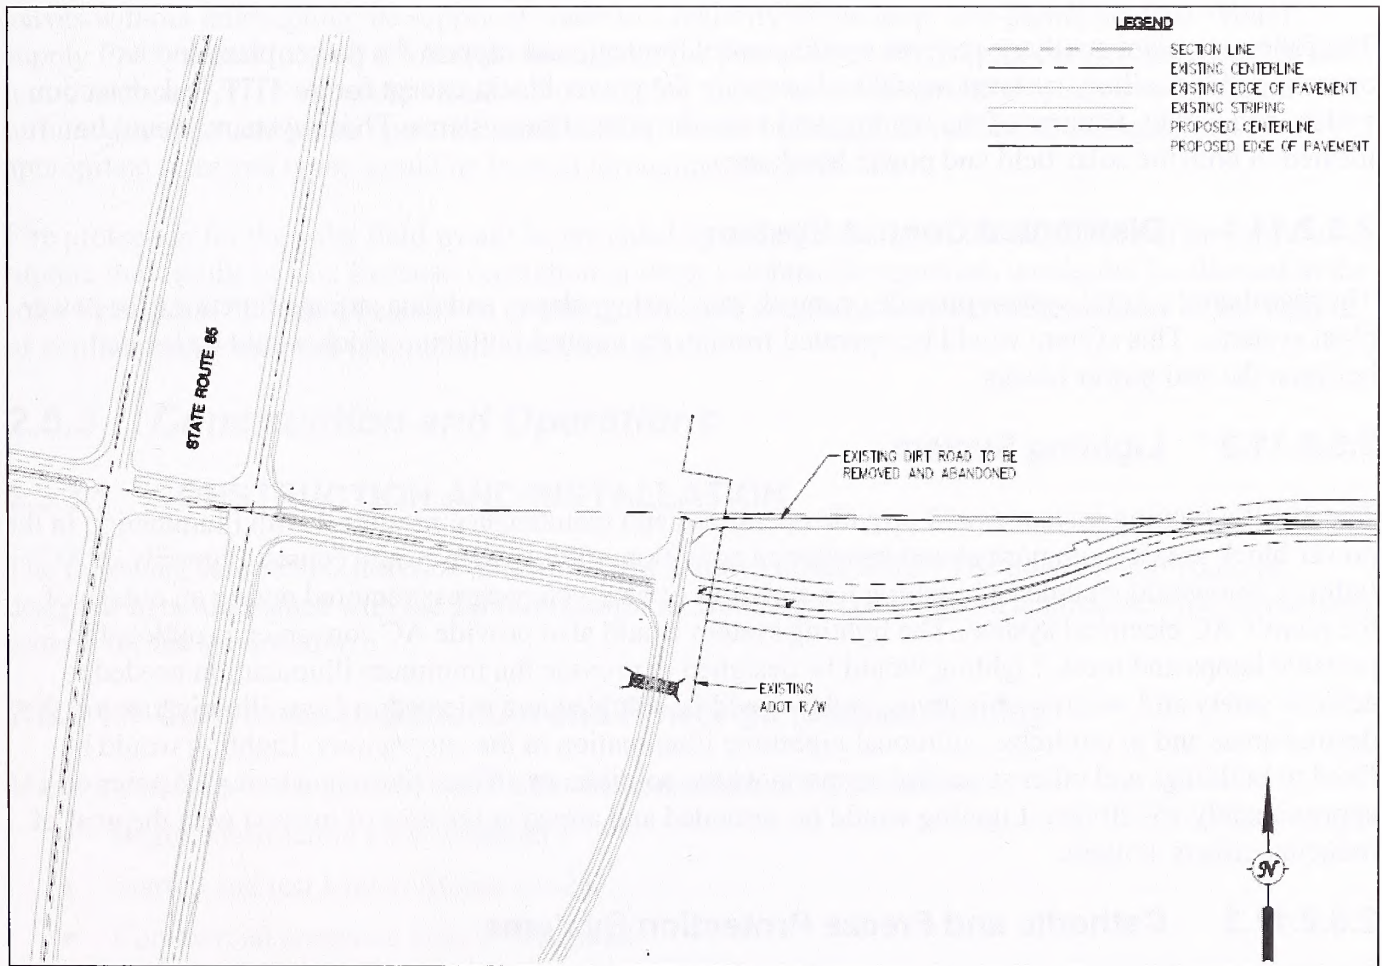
State Route 85 SSEP (Riggs Road) road intersection improvement.
